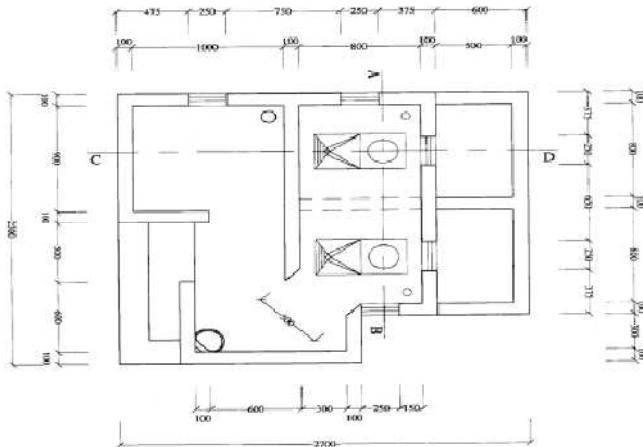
Drawing of a household UDDT with a shower cubicle on the left (source: PAARSS).
